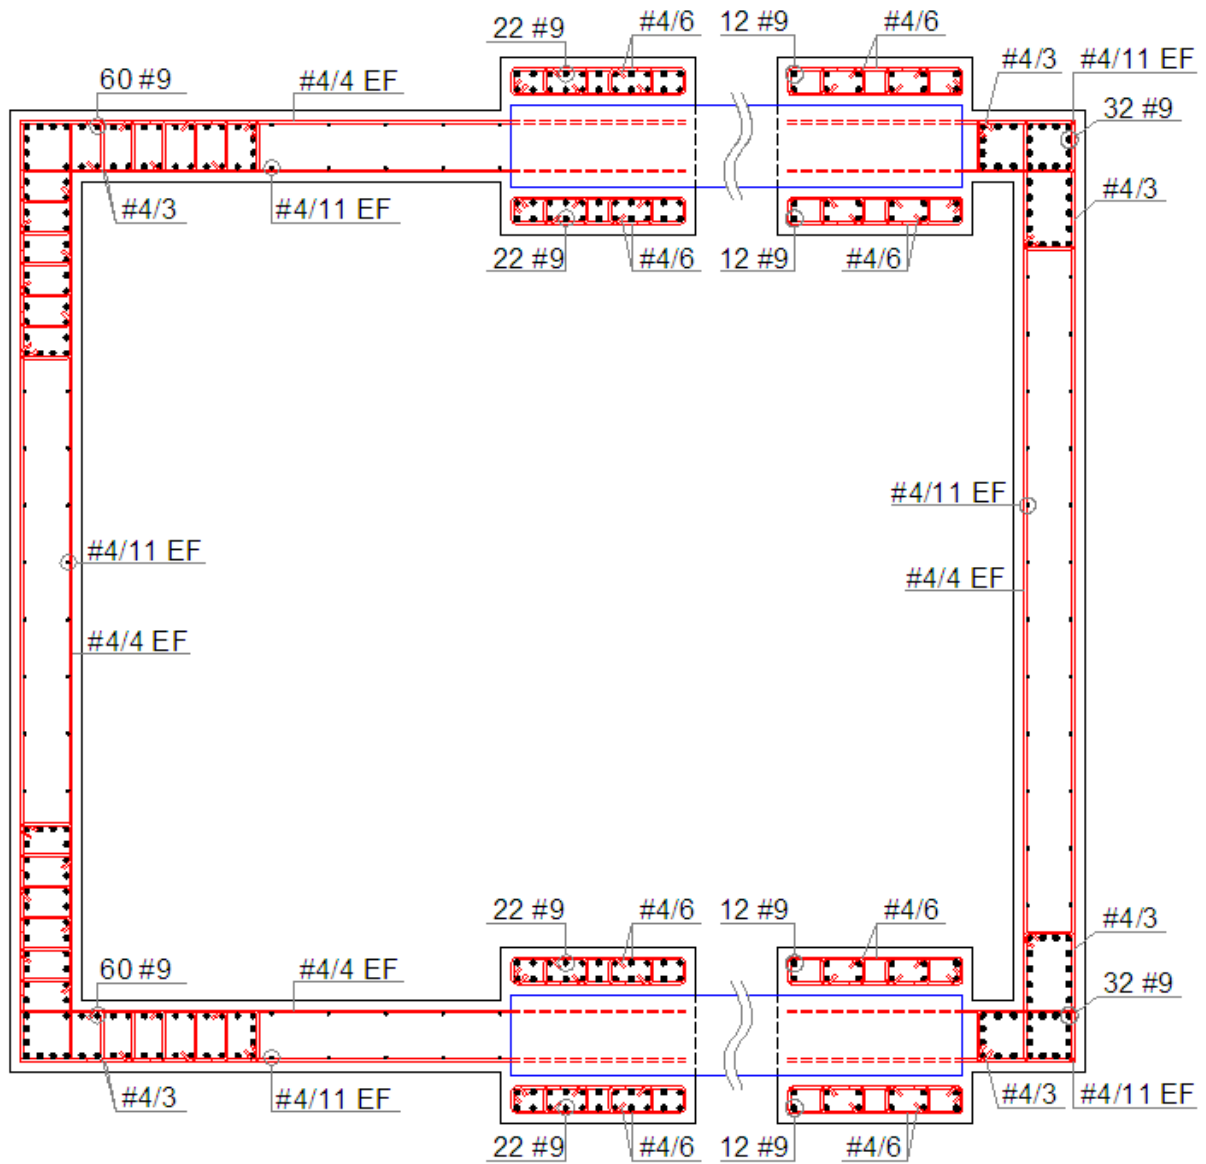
Plan of the CCW system after adding the barbells, dimensions are in feet
